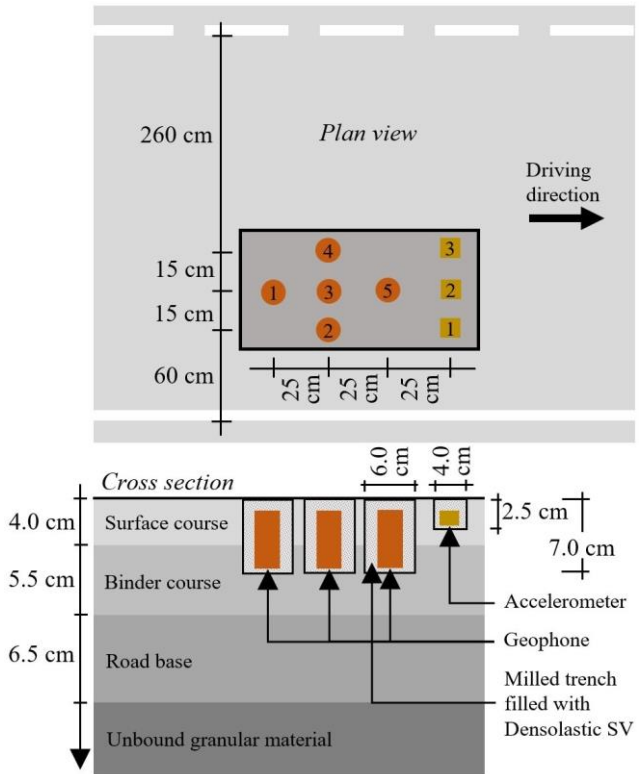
Plan view and cross section showing the positions of geophones and accelerometers embedded within the pavement.
